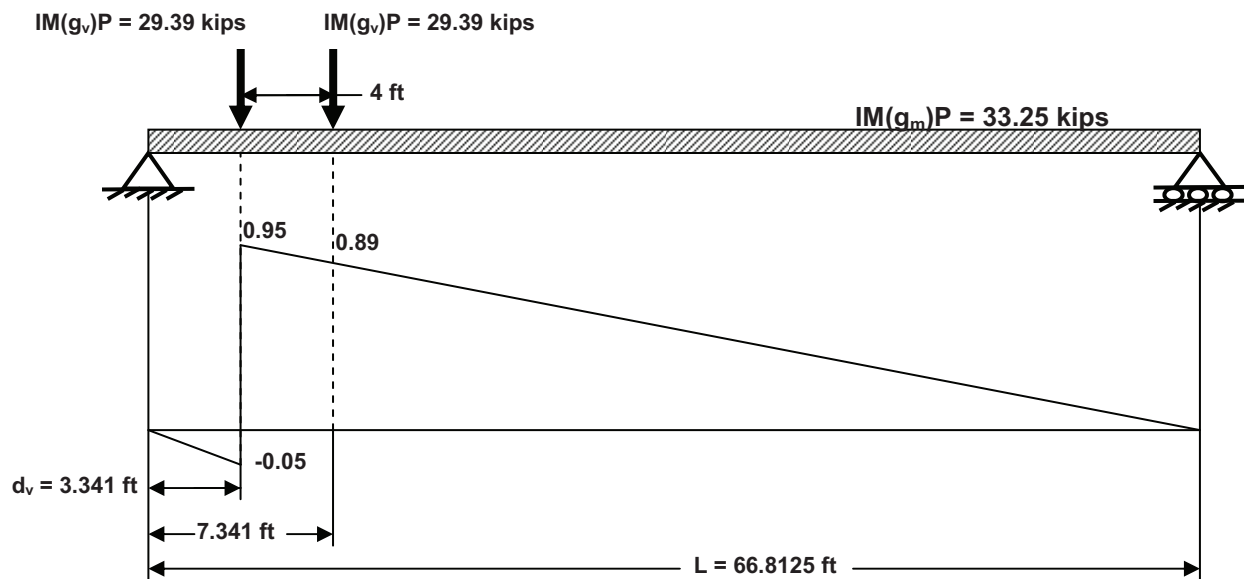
Interior Beam Shear Design Tandem at 3.341 ft
